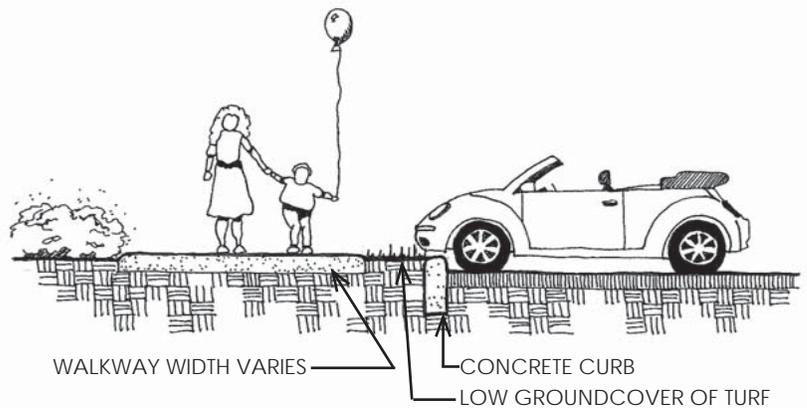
Parking Lot Curb - 6" Curb Adjacent Planted Area
